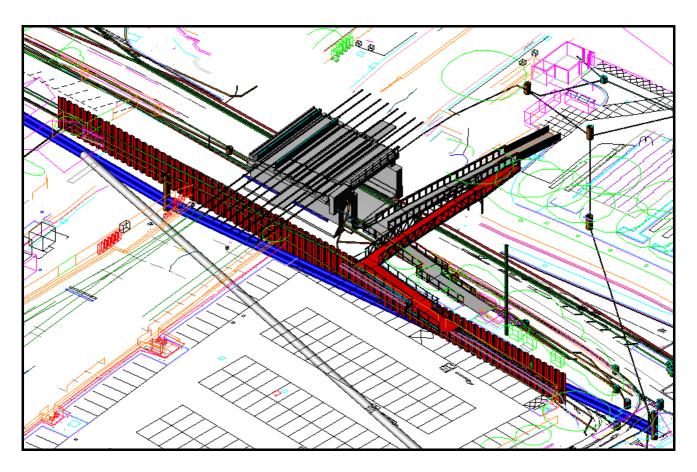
3D model extract at Botley Road, showing Proposed Footbridge (red) compared with existing (grey)
